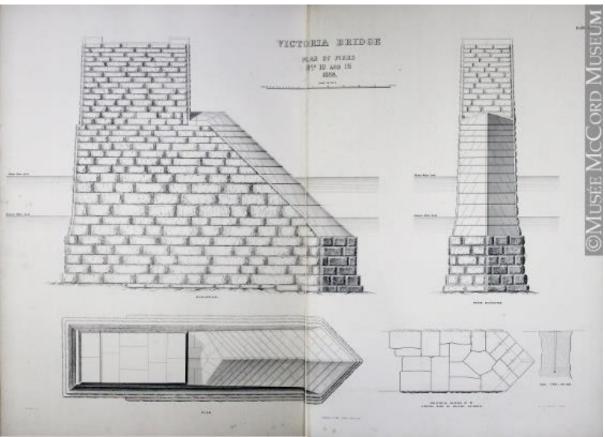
Plan of Piers Nos. 10 and 15, 1859, W. O. Gooding, in Hodges, Construction of the Great Victoria Bridge, 1860. [MM: M15934.84].
